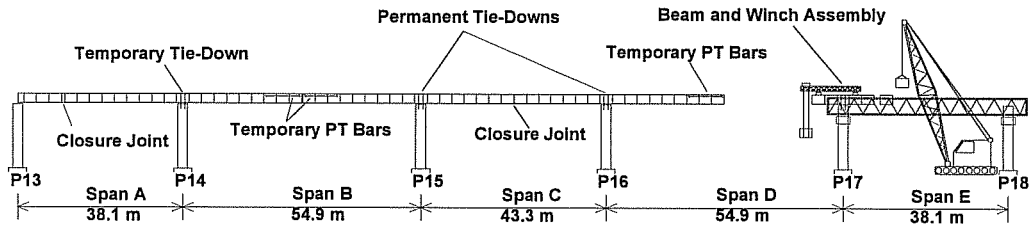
Phases V and VI, cantilevering of segments from P17, placement of temporary truss, and erection of 38.1-meter Span E.
